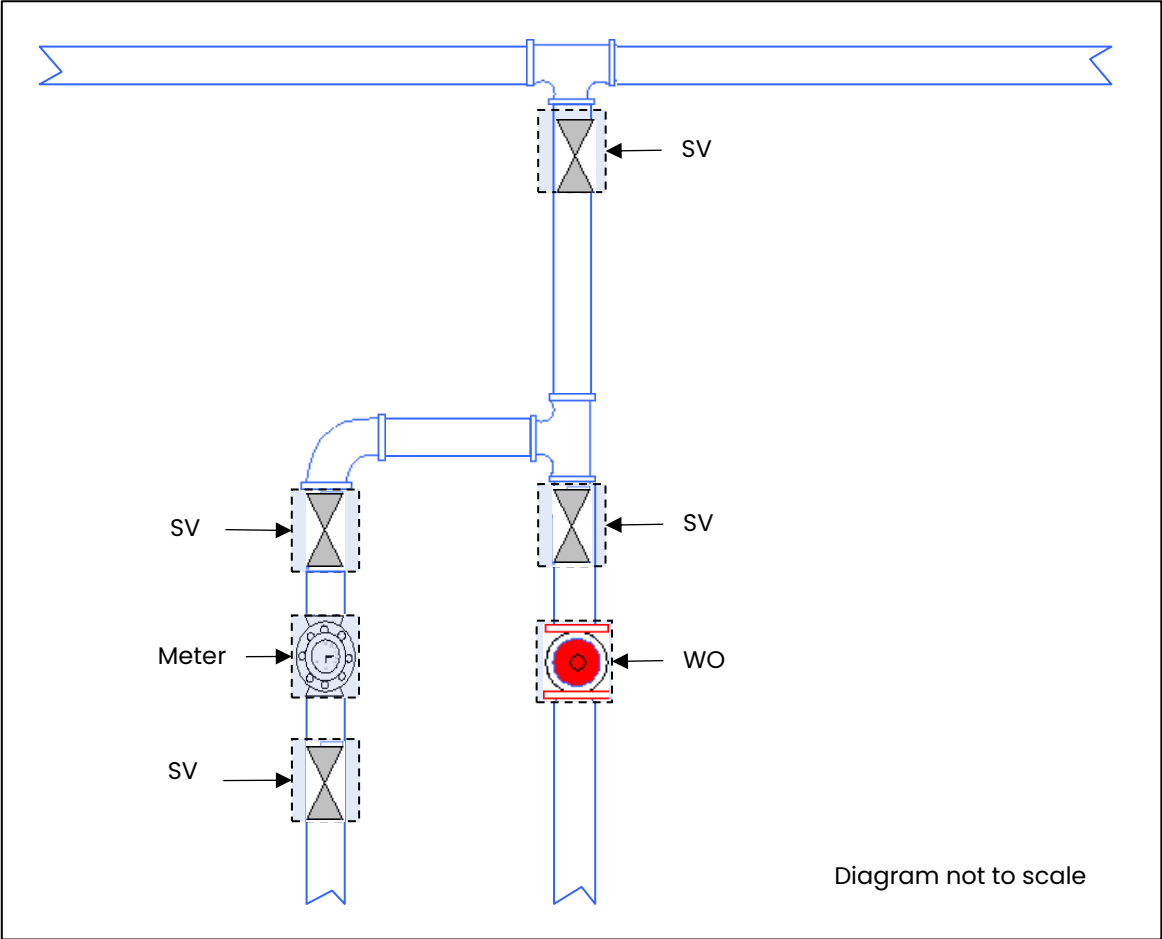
Downstream Tee and Branch Connection Outline Drawing
